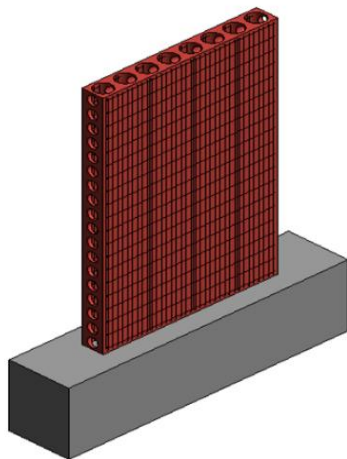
CFRP two-way Hollow core shear wall without Channel shaped boundary elements
